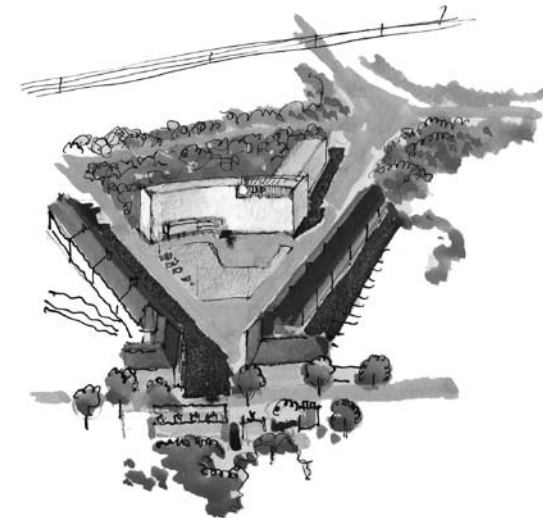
Arne Jacobsen and F. Lassen. Lyngby Town Hall, 1938. New town hall surrounded by housing blocks built in 1923.
